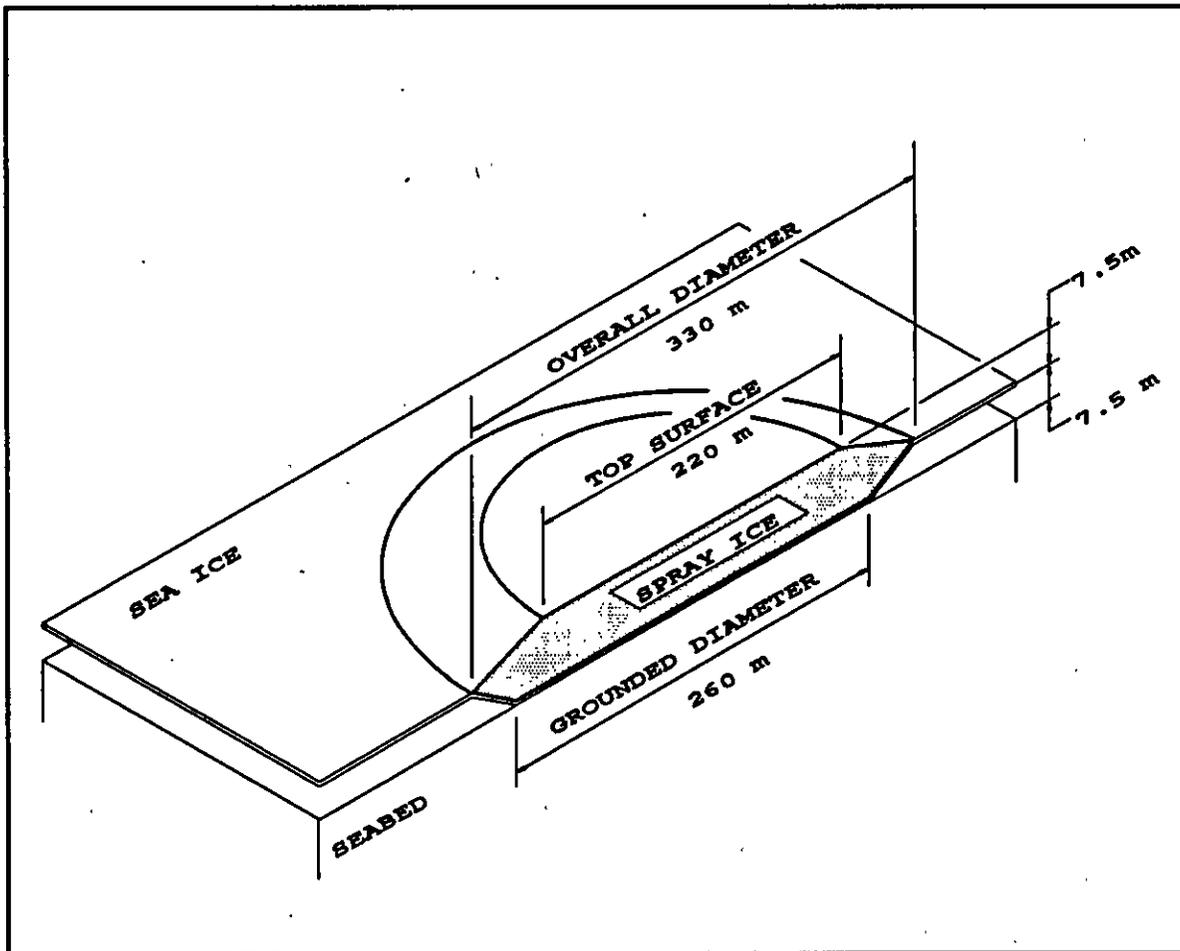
Isometric cross-section of a spray ice drilling island. Dimensions are based on the Mars Island as-built.
